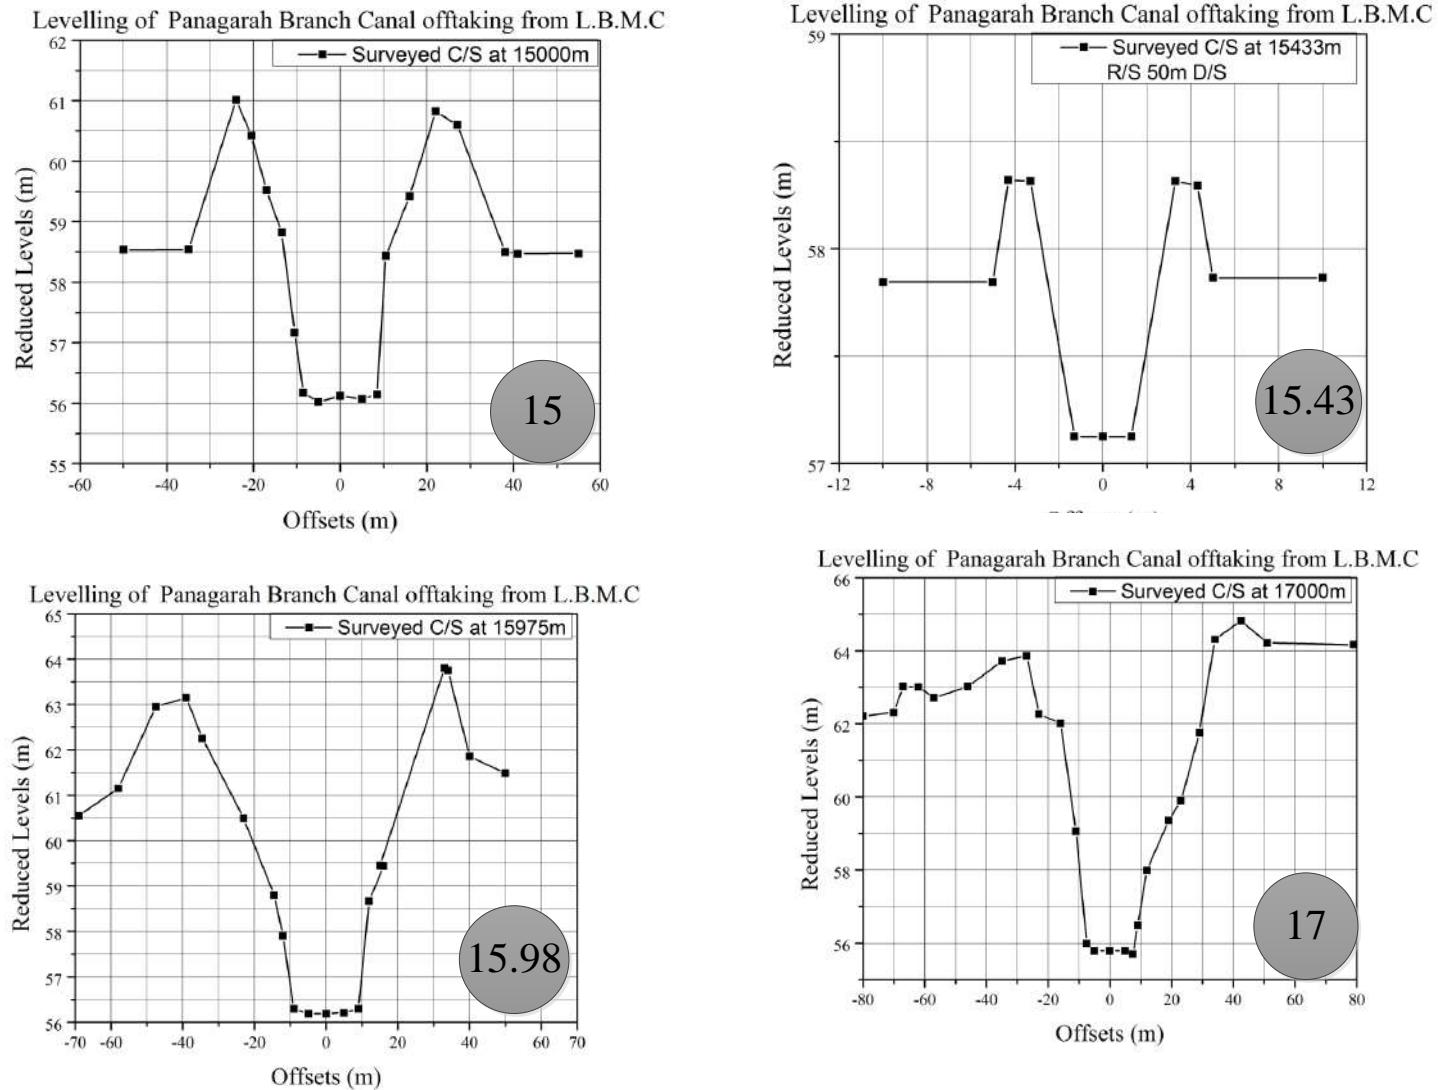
Canal cross section from 15 km to 17 km on Panagarh branch canal
